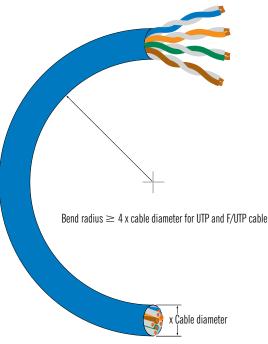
Minimum Bend Radius UTP and F/UTP Cable
